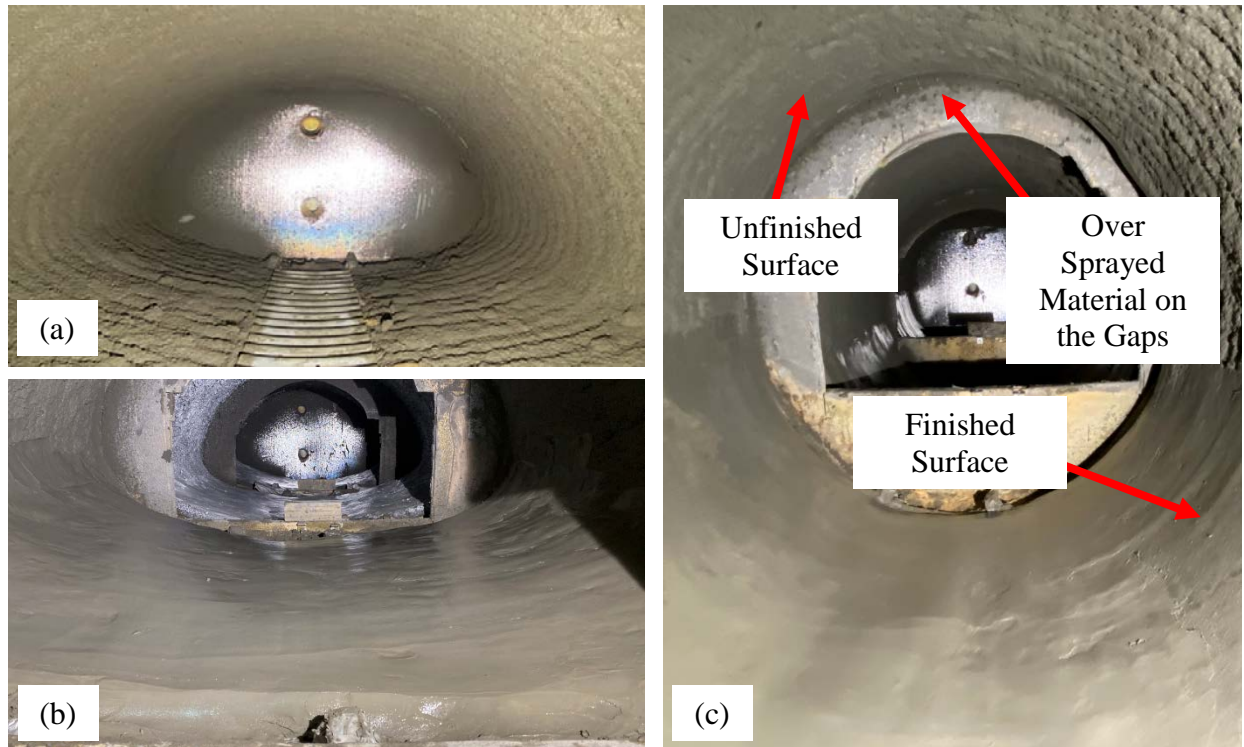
Cementitious SAPL Installation: (a) pipe arch CMP with un-sprayed invert section for applicator's movement, (b) completed installation on pipe arch CMPs, and (c) SAPL installation on circular CMPs with bottom half finished and top half unfinished surfaces.
